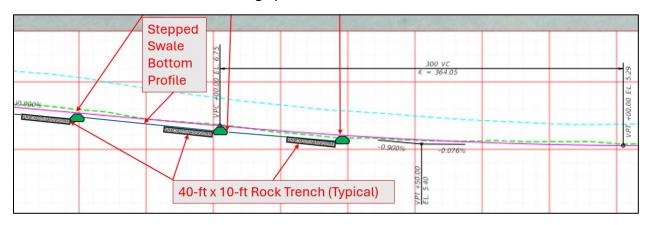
Stepped Dry Retention Swales at bridge approaches and departures
